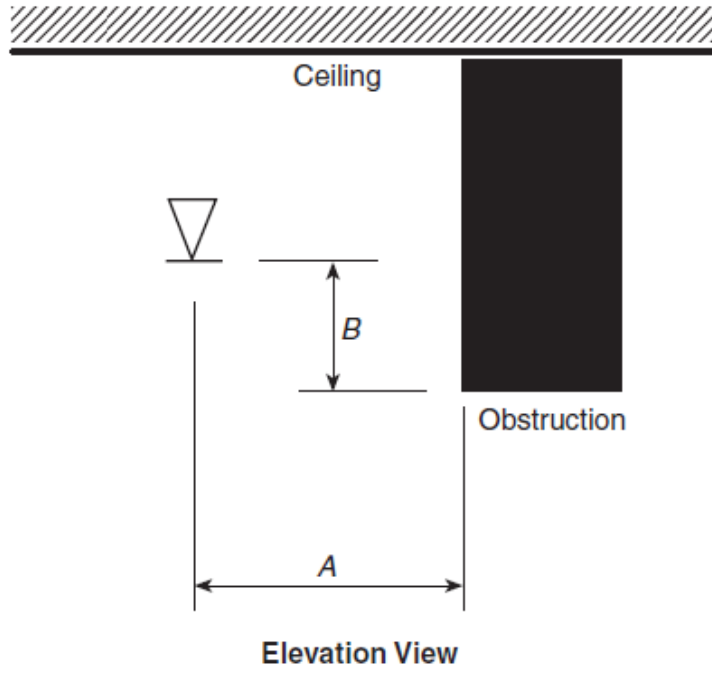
(a) Positioning of Sprinkler to Avoid Obstruction to Discharge (SSU/SSP).
